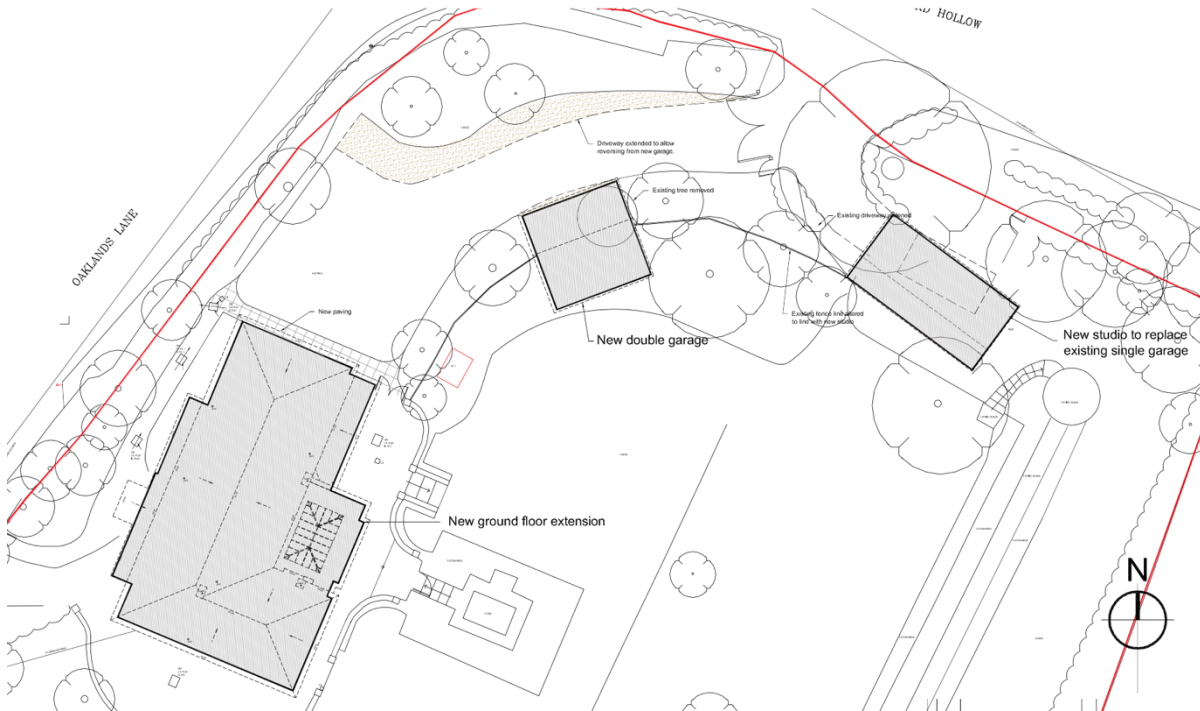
Proposed site plan which includes a single-story extension to the existing residential property, the demolition of a garage to make way for a new studio and the construction of a new double garage.
